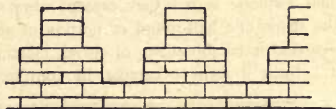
Battlements crowning an Assyrian wall of bricks.
